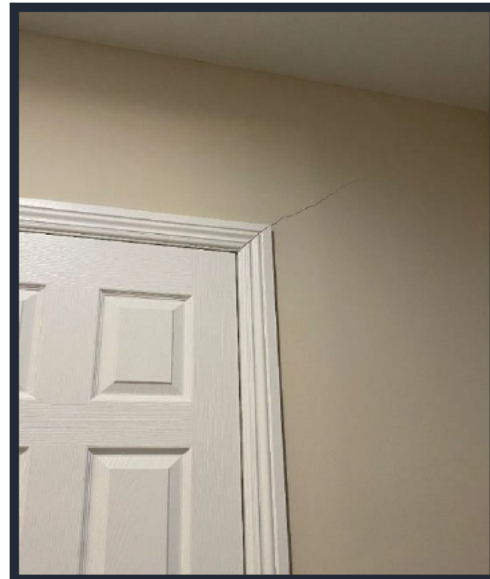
Lot 19 Crack at the top corner of half bath door, front entrance hallway
